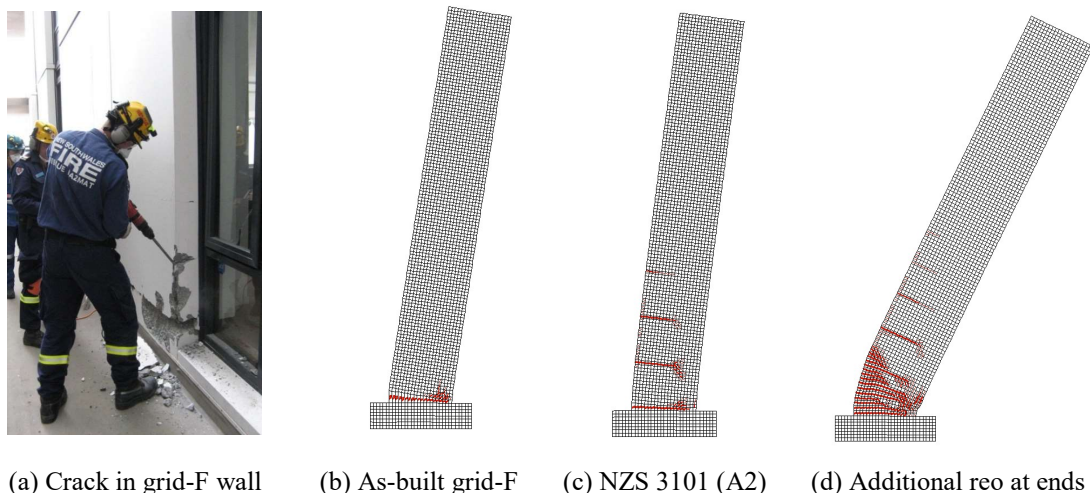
Actual grid-F wall damage compared with deformed shape (magnified x5) and crack patterns from wall models
